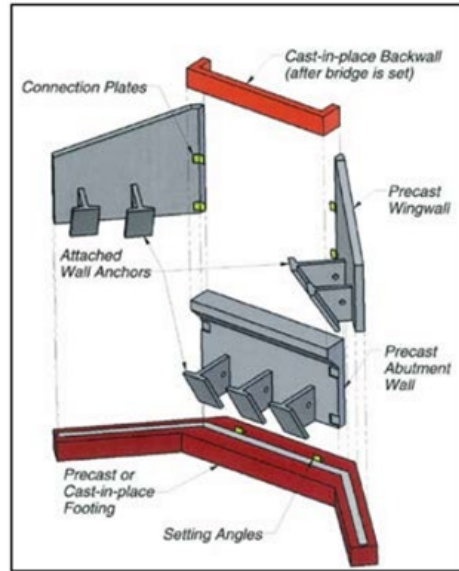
Eastern Bridge Foundation (courtesy Contech Bridge Solutions)
